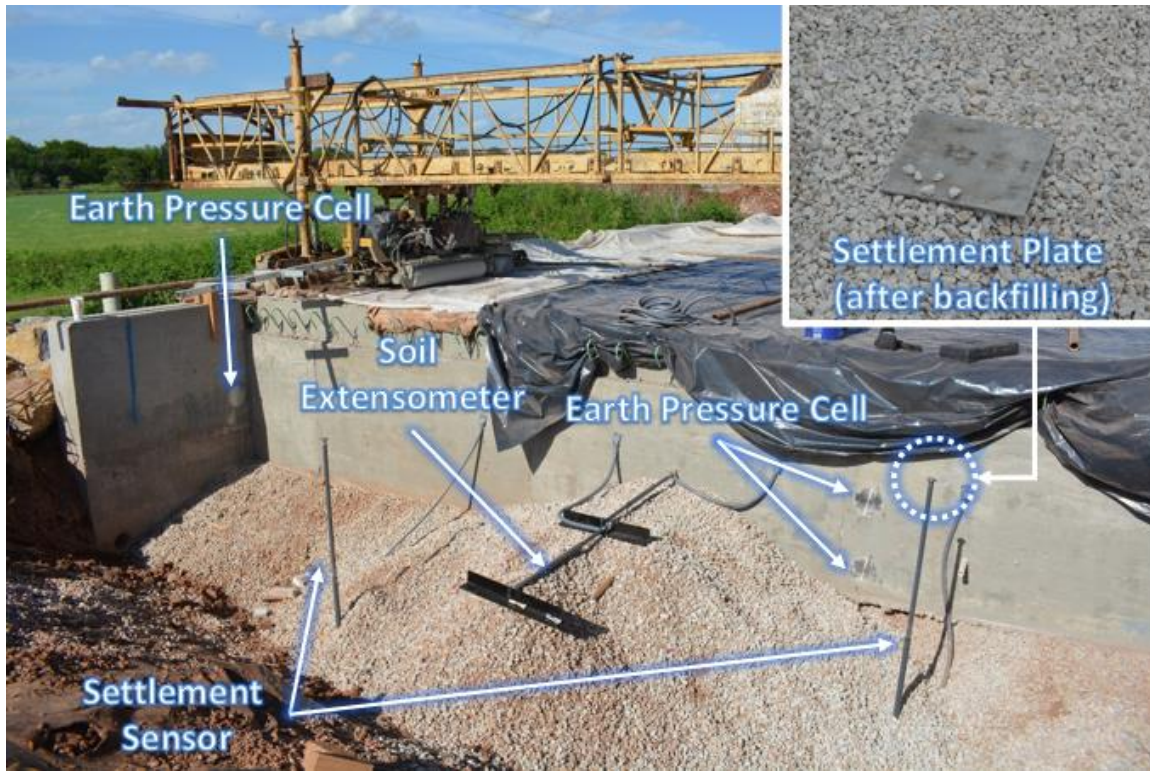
Instrumentation and backfilling of China Creek Bridge's west abutment. Top right picture shows a close-up view of the steel plate attached to the top of settlement sensors after completion of backfill placement.
